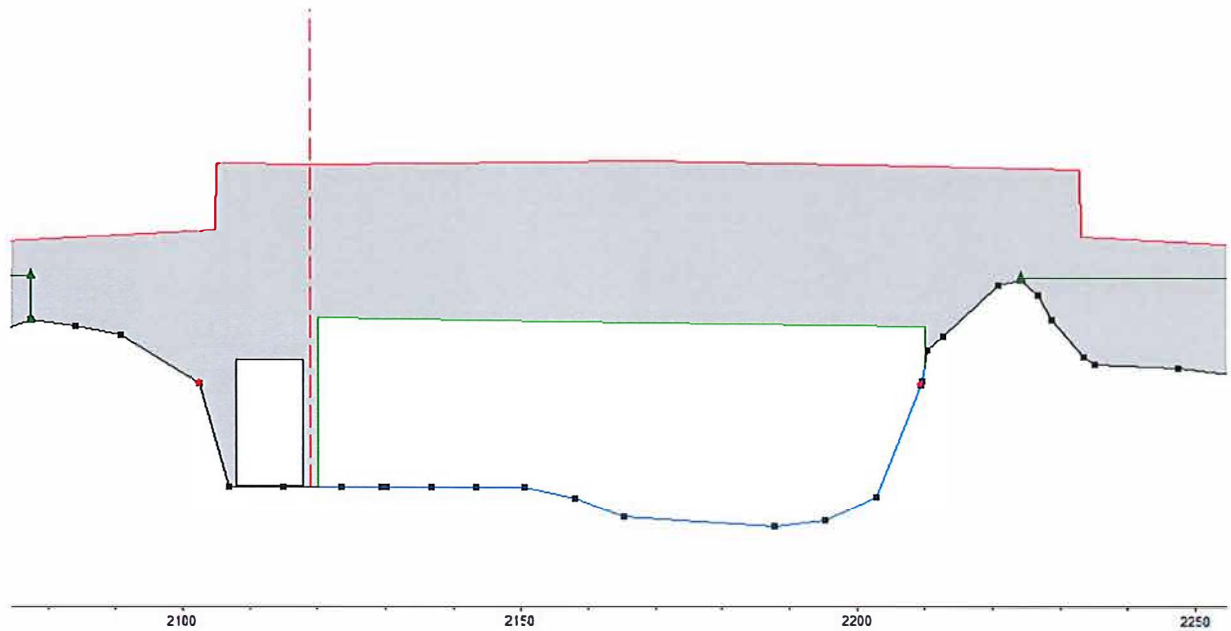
State Street Bridge with Proposed Box Culvert Upstream Cross-Section
